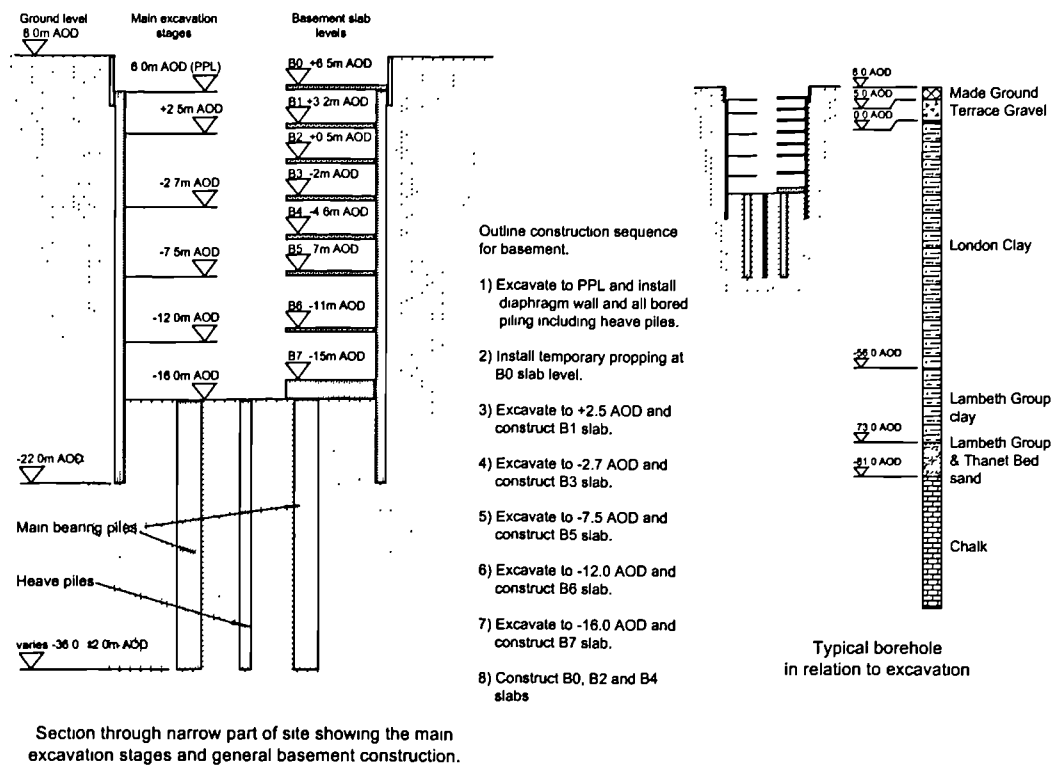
Typical section through the top down basement construction at the site of the former Knightsbridge Crown Court showing the general construction sequence and a typical borehole.
